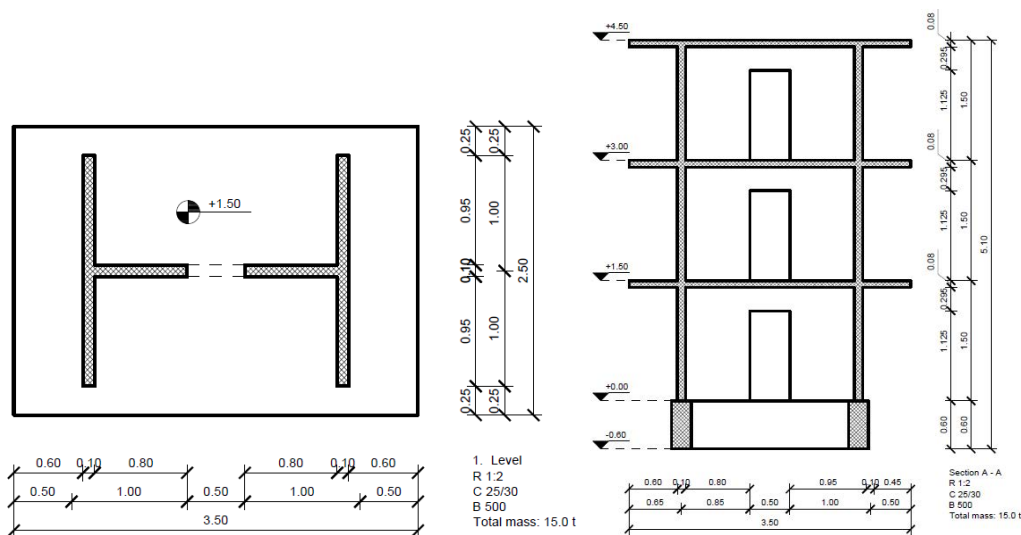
Drawings of the specimen with coupling beams (floor plan and cross-section)
